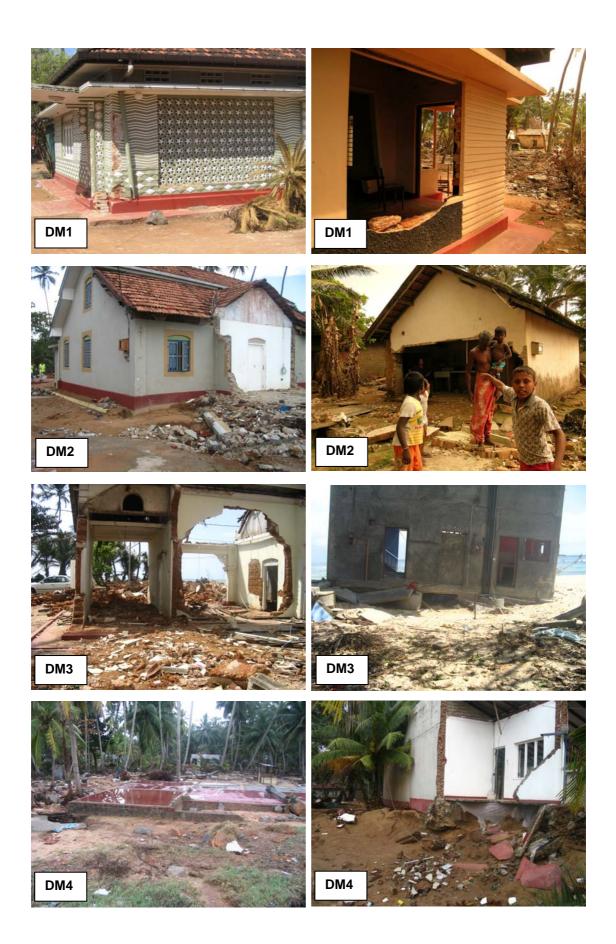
Photographs illustrating categories of damage DM1 to DM4 in unreinforced masonry structures in Sri Lanka
